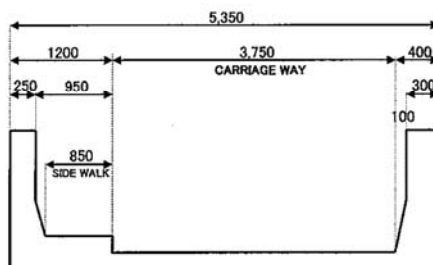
Typical cross section of one-lane bridge (Adjusted to NB load)
